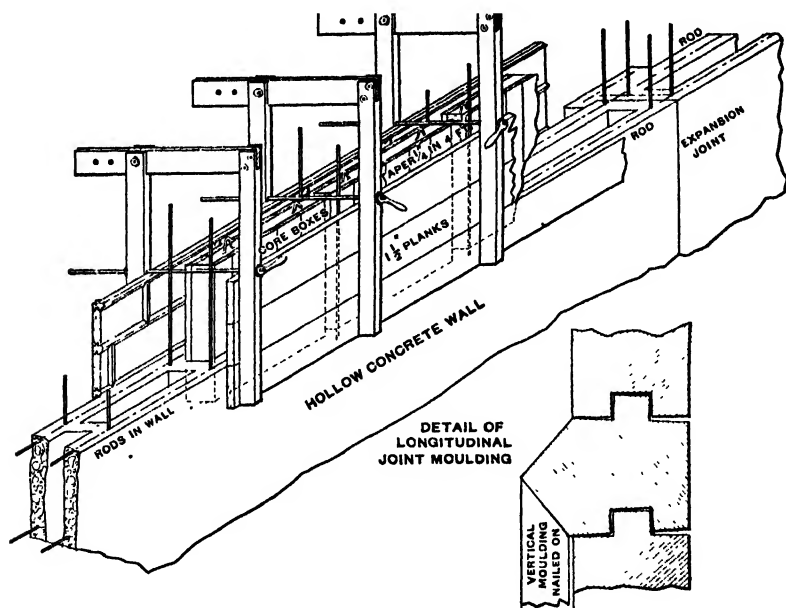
Forms for Hollow Walls. (See p. 622.)
